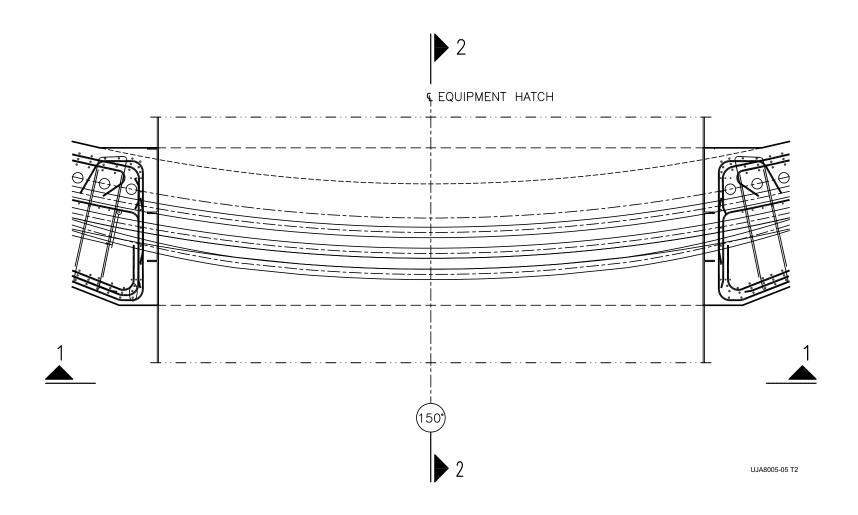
E.1-12—Reinforcement Pattern for Section 1-1 of the Equipment Hatch Area
